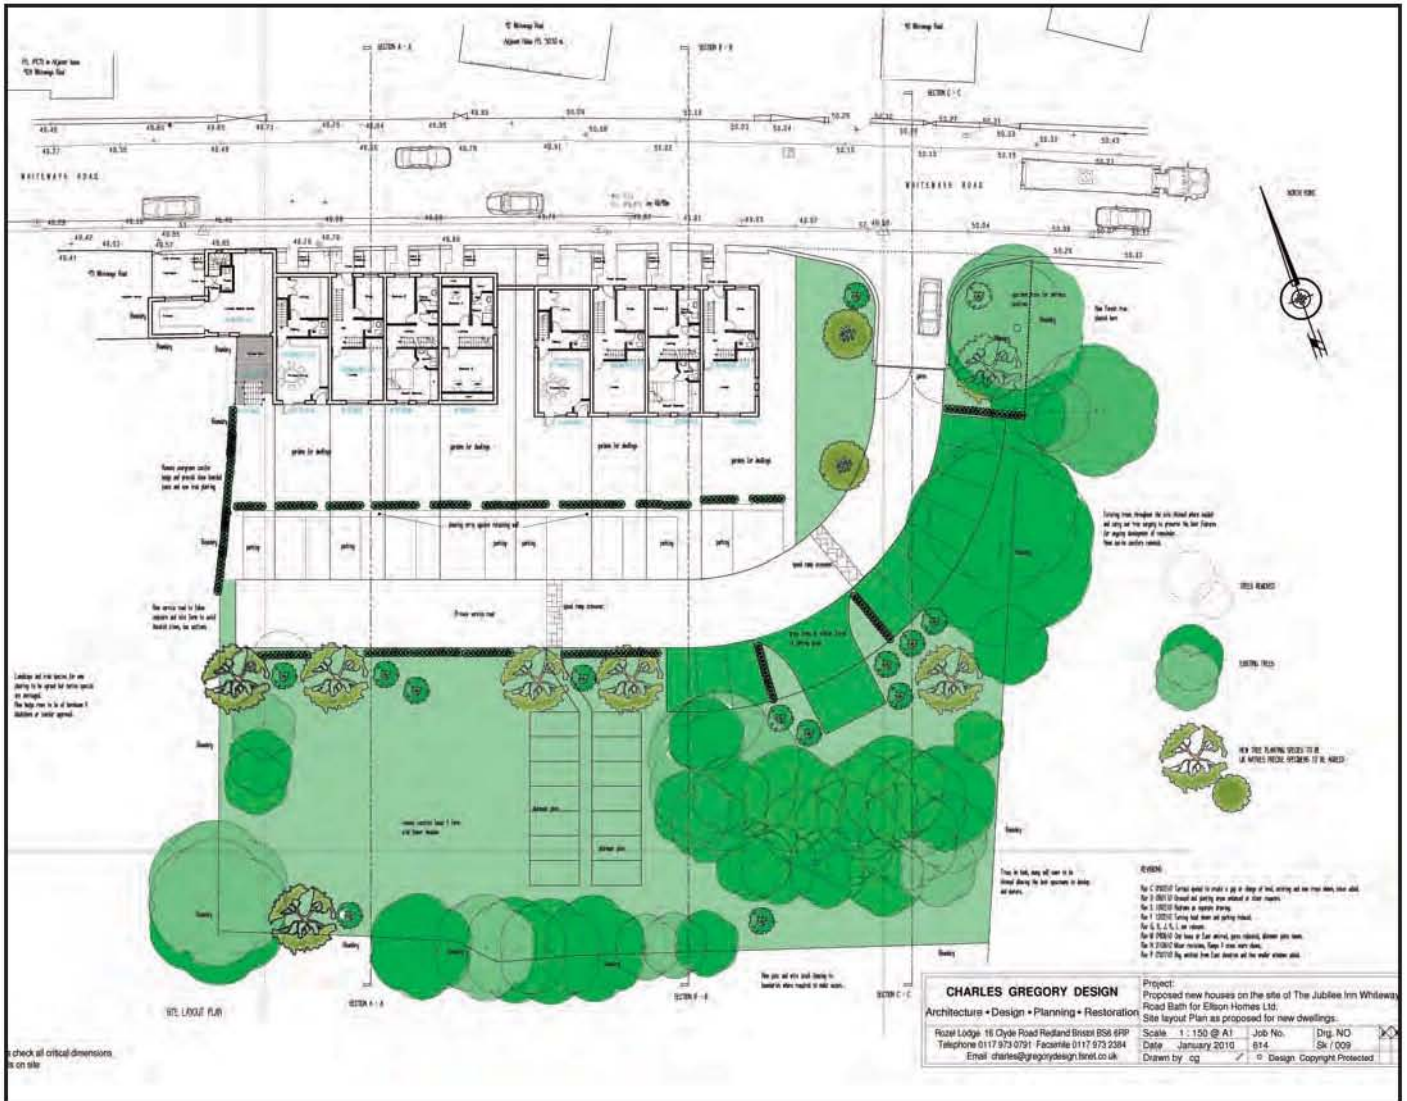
'Site layout plan as proposed for new dwellings' (courtesy of the client)
